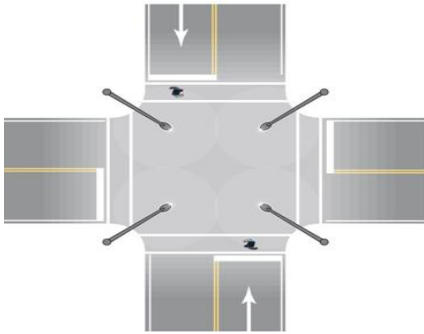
Traditional intersection lighting layout, Source: FHWA Report on Lighting Design for Crosswalks, April 2008.
